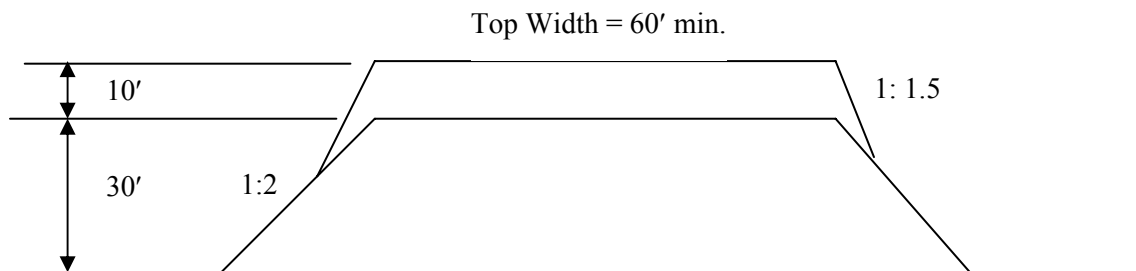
Idealized cross section of embankment fill + surcharge.
